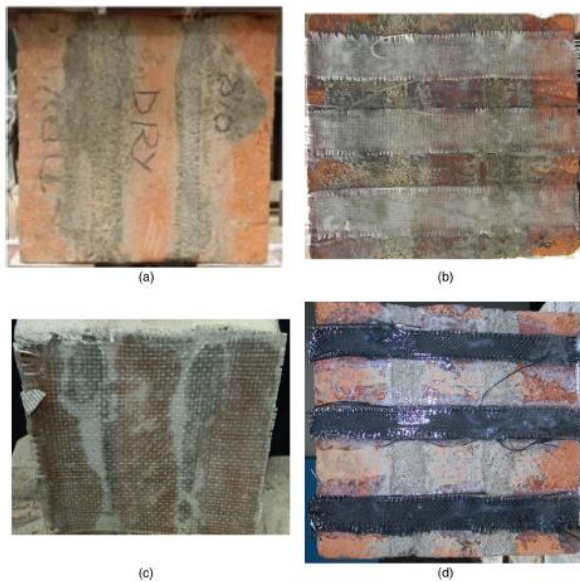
Masonry triplets reinforced with CFRP composite [62]
